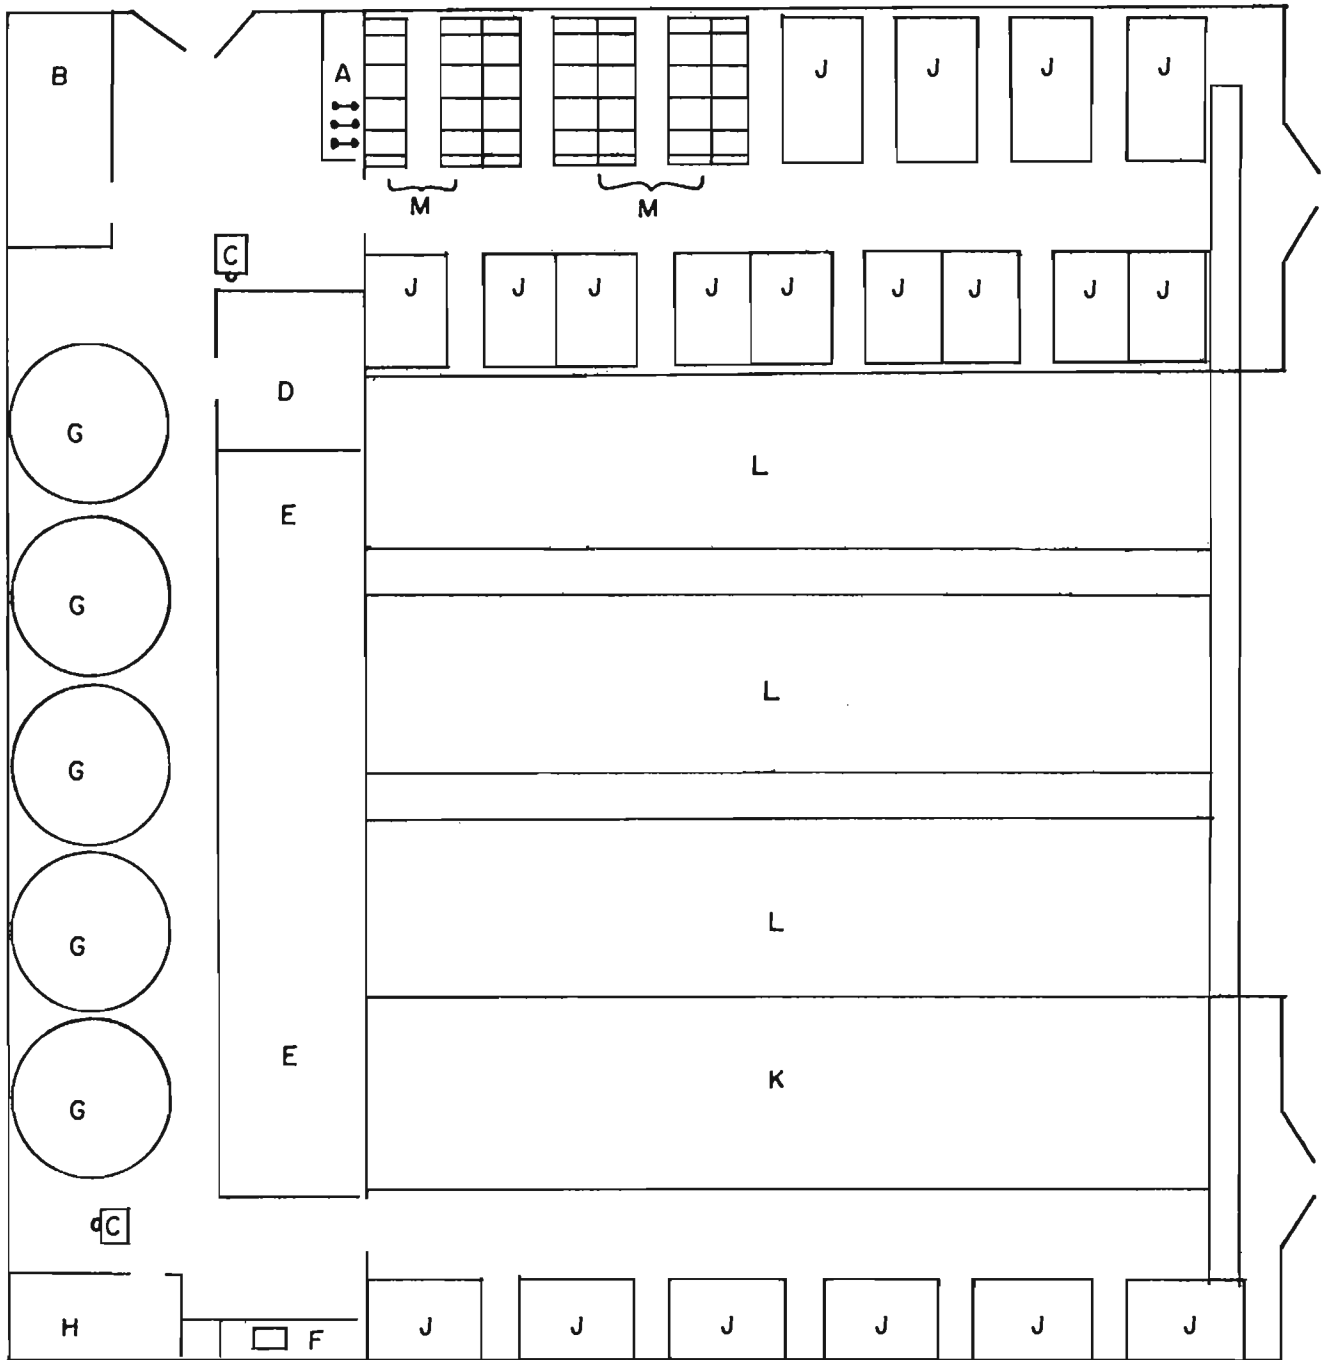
LAYOUT-TROUT HATCHERY Scale: 1cm=1.22m
